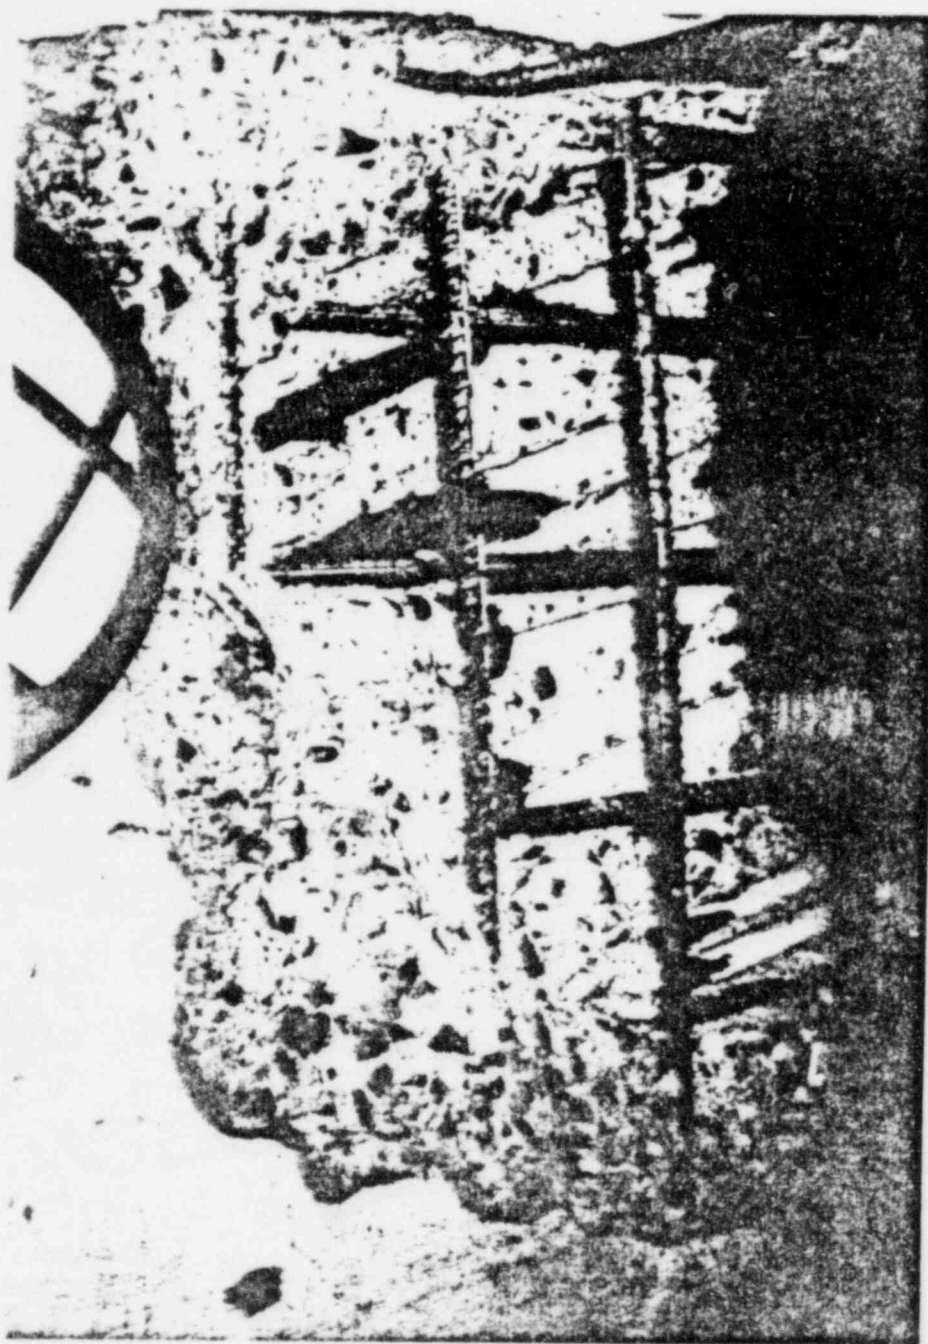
Erosion of reinforced concrete in the HDR facility due to direct break jet impingement
